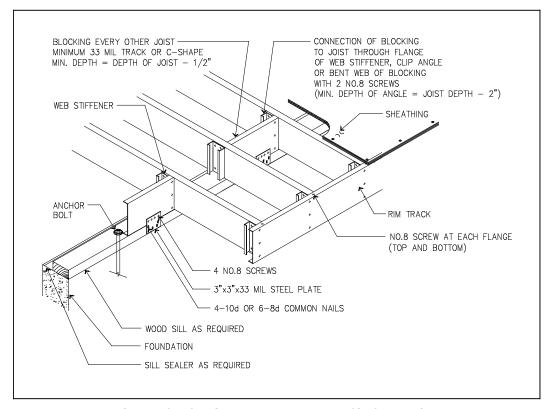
Cantilevered Floor to Wood Sill Connection
